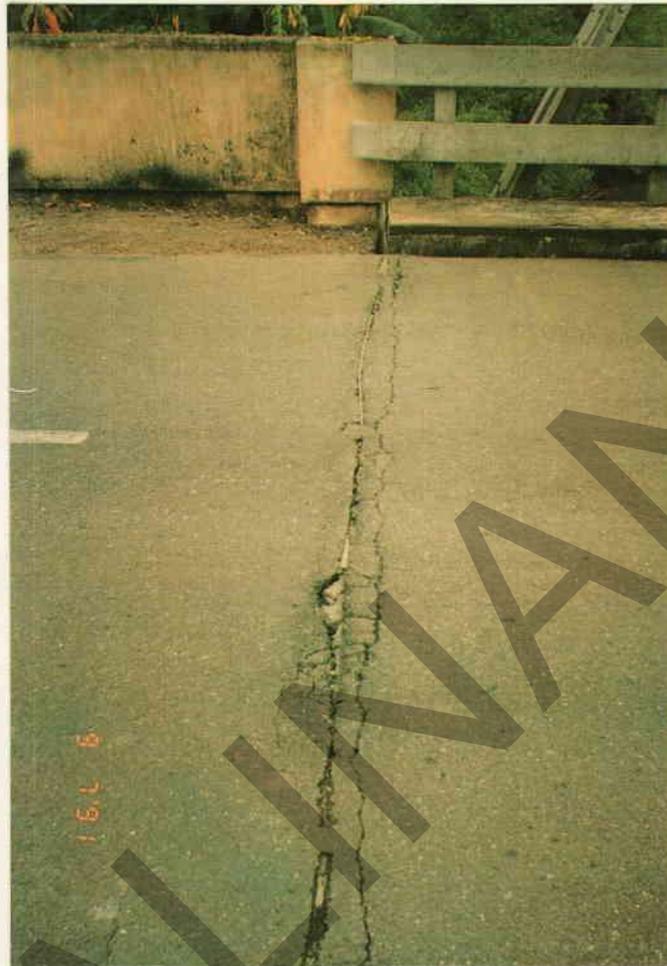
Cracked Asphalt at Expansion Joints both Abutments
